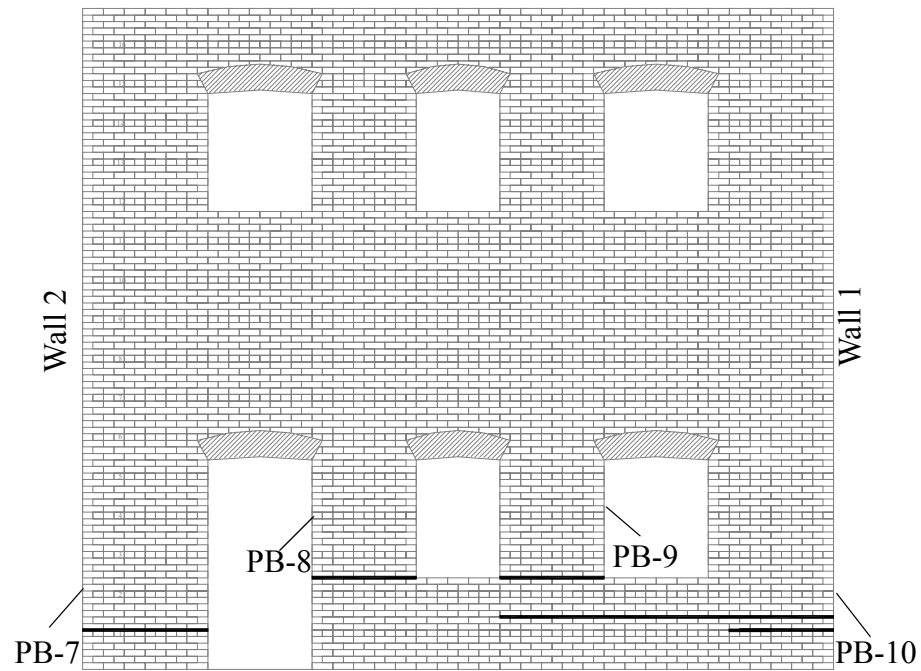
Crack pattern of Wall B following Test Run 10.
